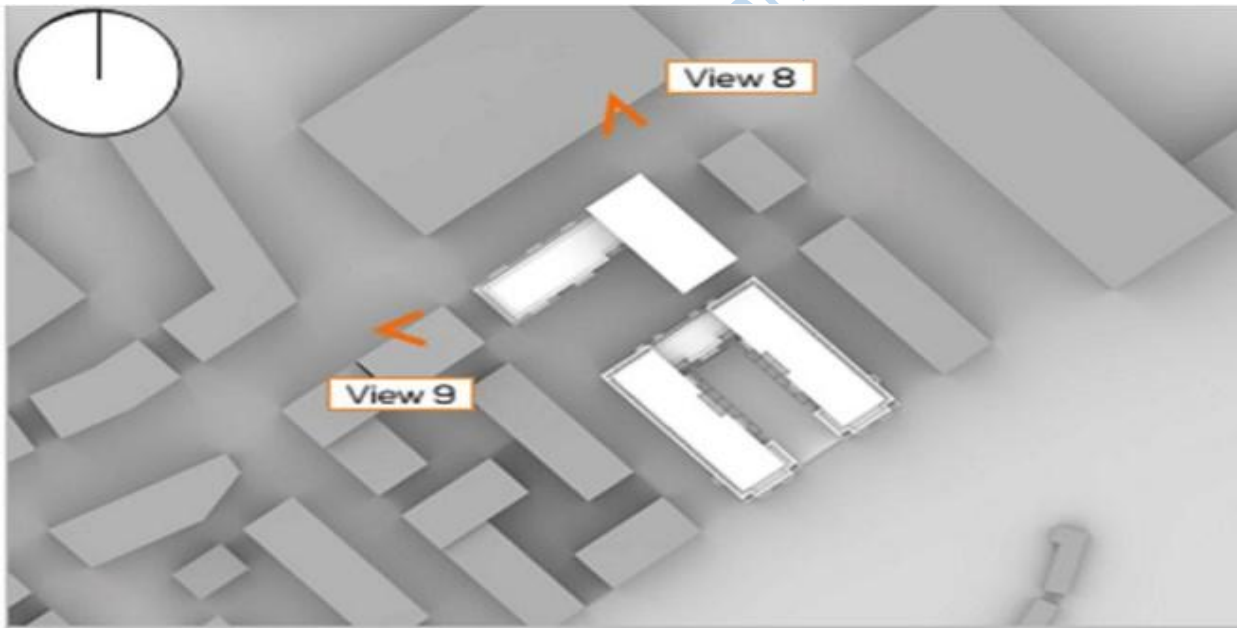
The Layout of a proposed Scheme for Brent Cross South at London
